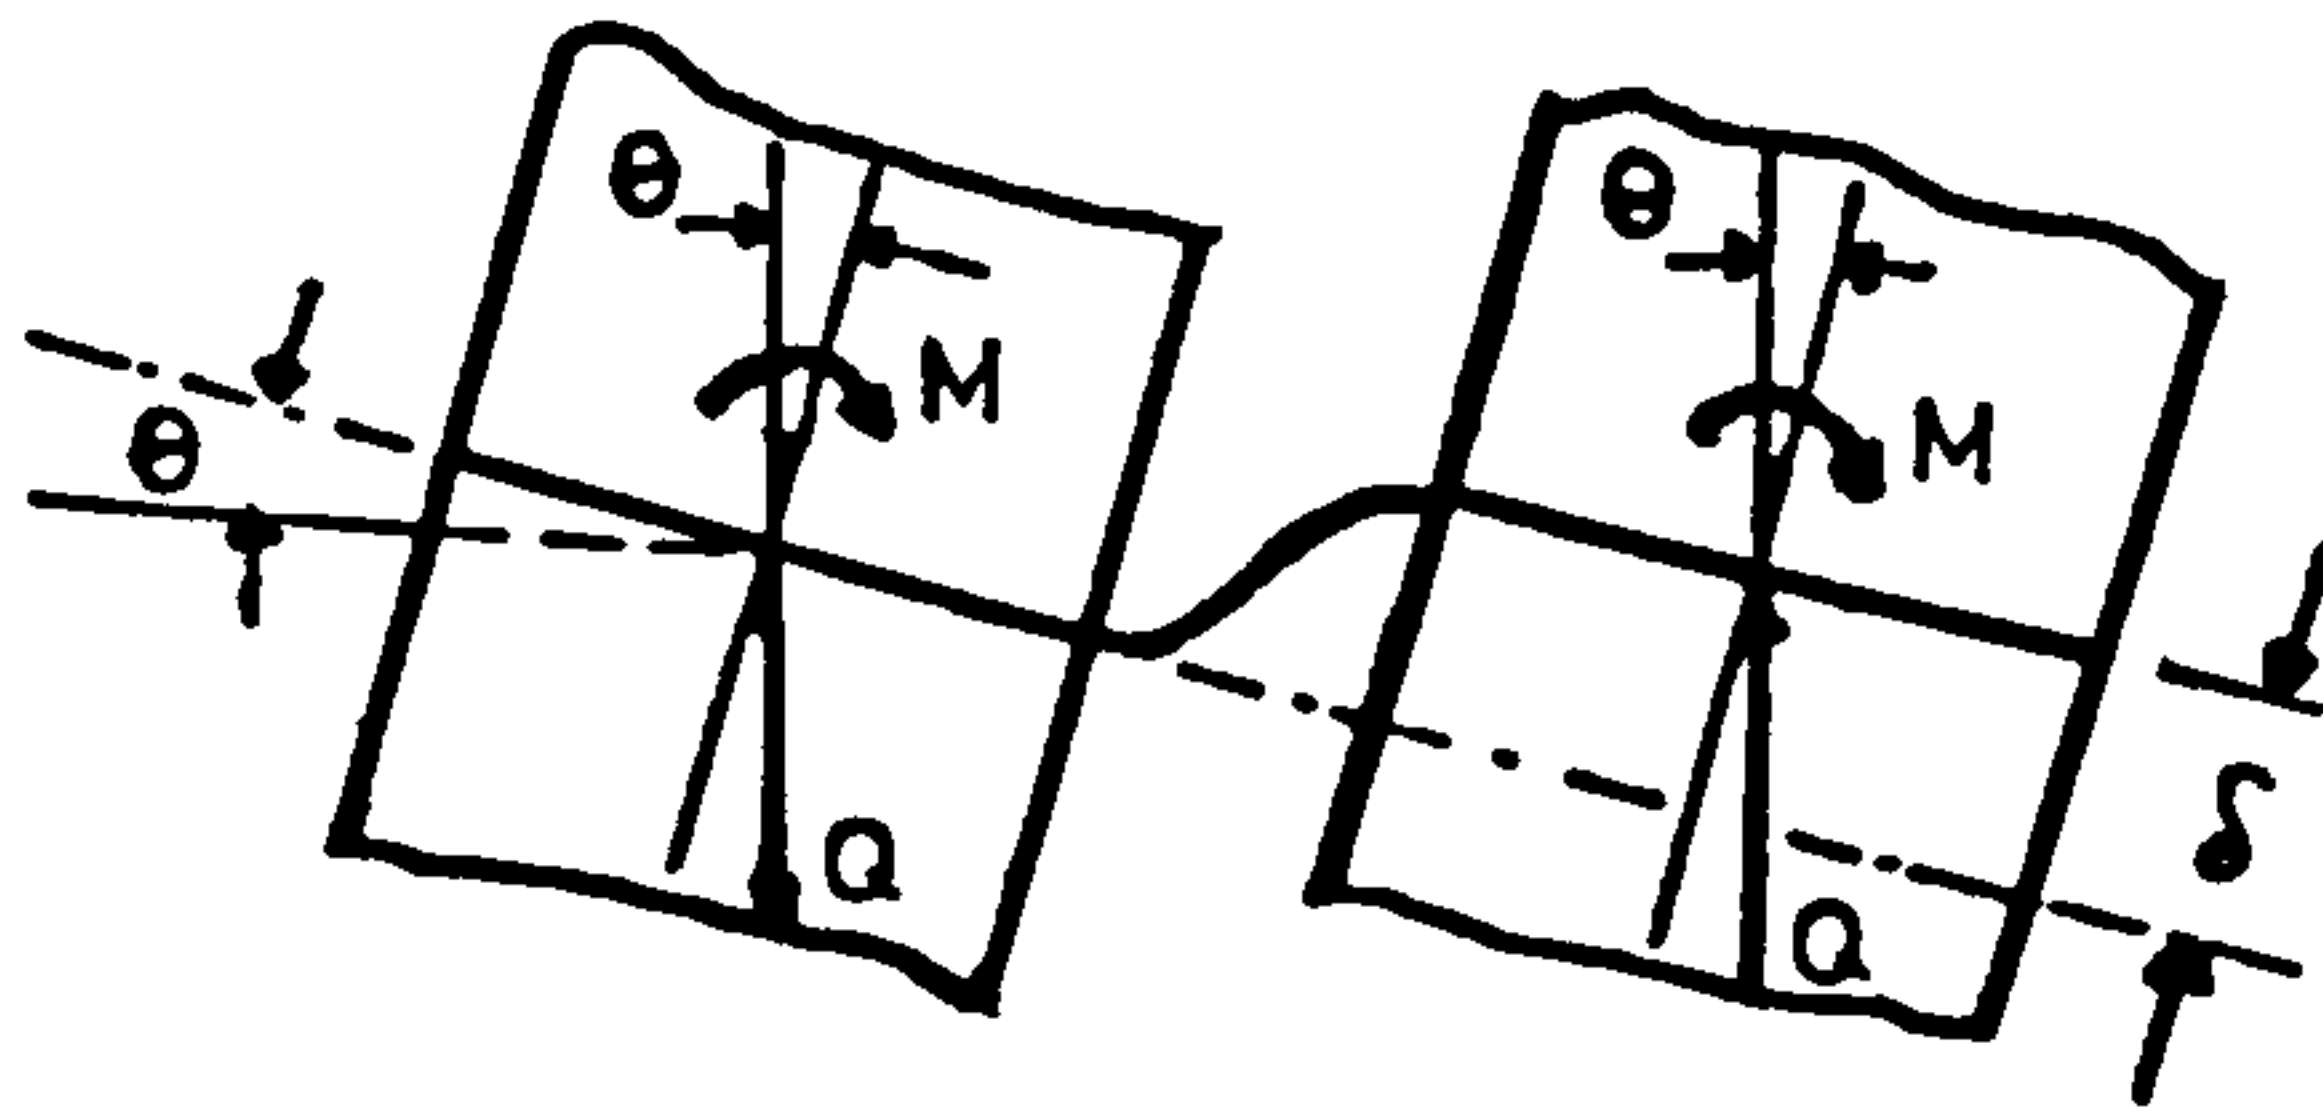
Deflected shape of the connecting slab in a shear wall structure.
